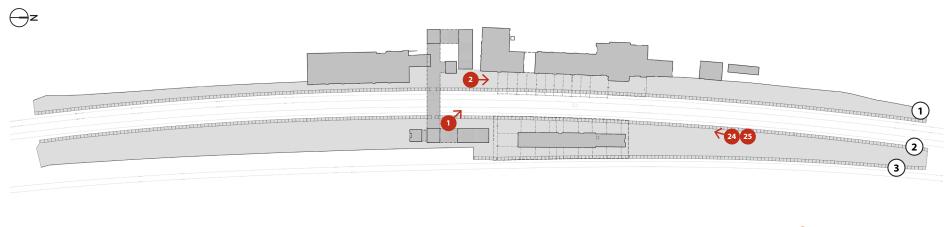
Key plan of Wellingborough Station showing location and direction of photos of platform 1
